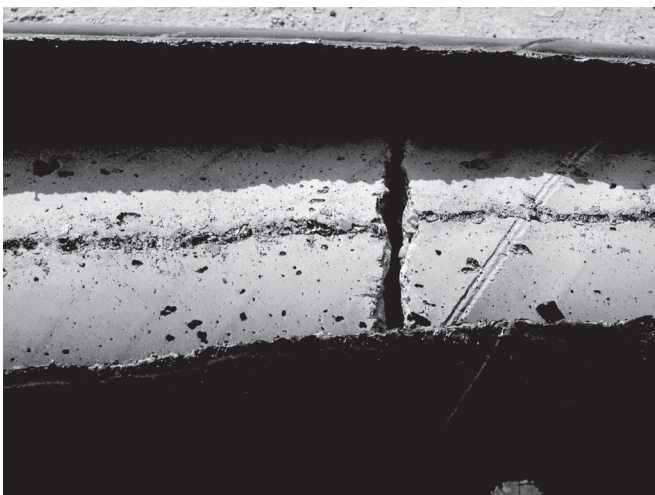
Photo of the concrete core and damaged concrete region after completion of testing.
